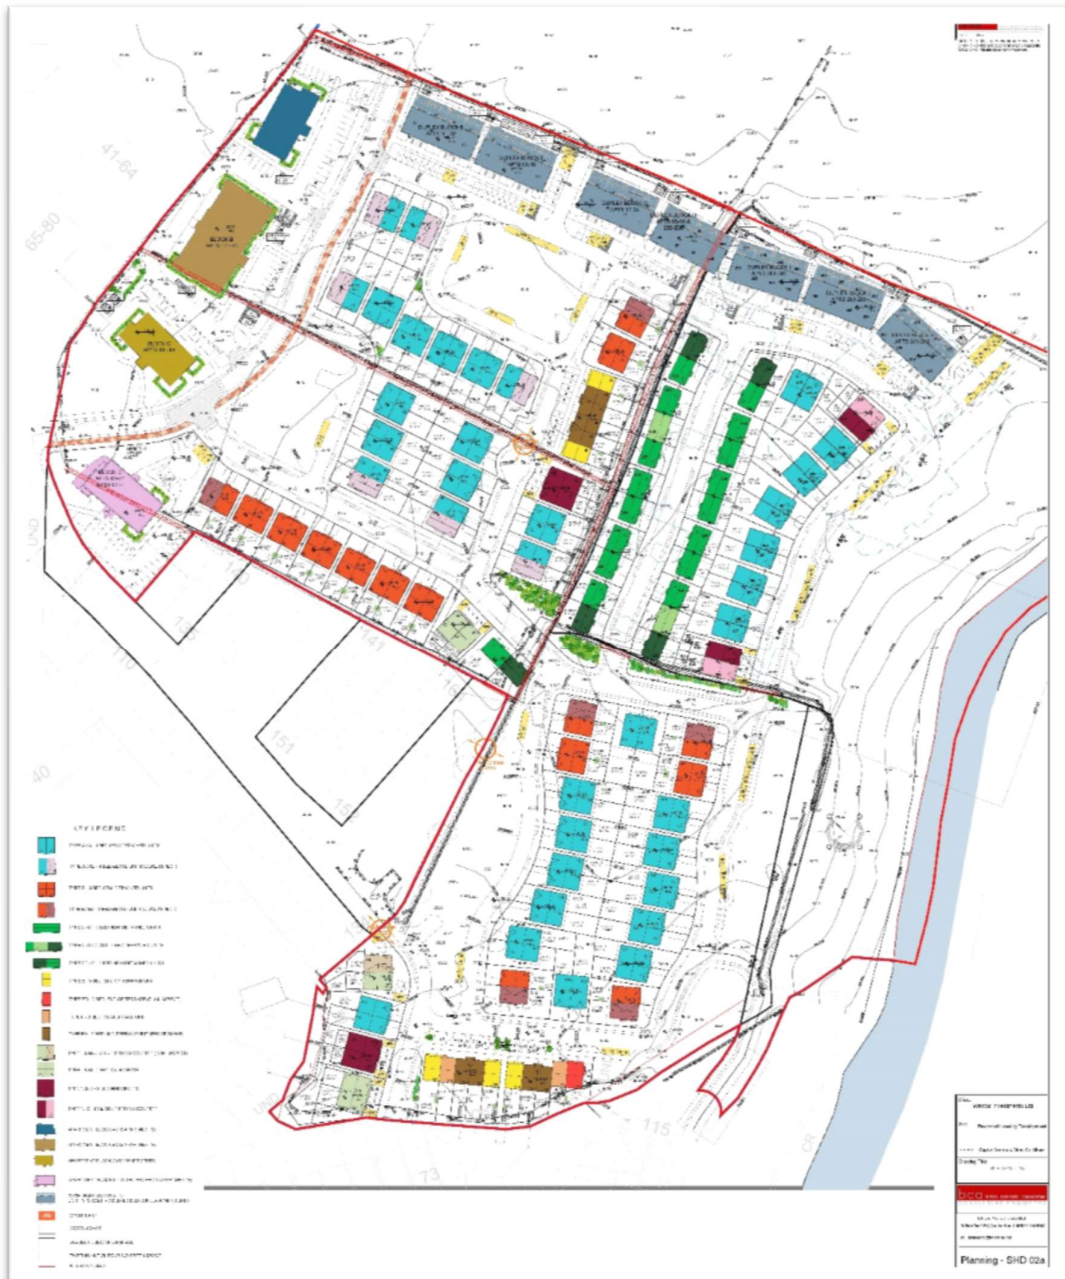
Rotated View above (Site Plan) – Initial sketch Site Plan issued for first consultation with Kildare Co.Co.
